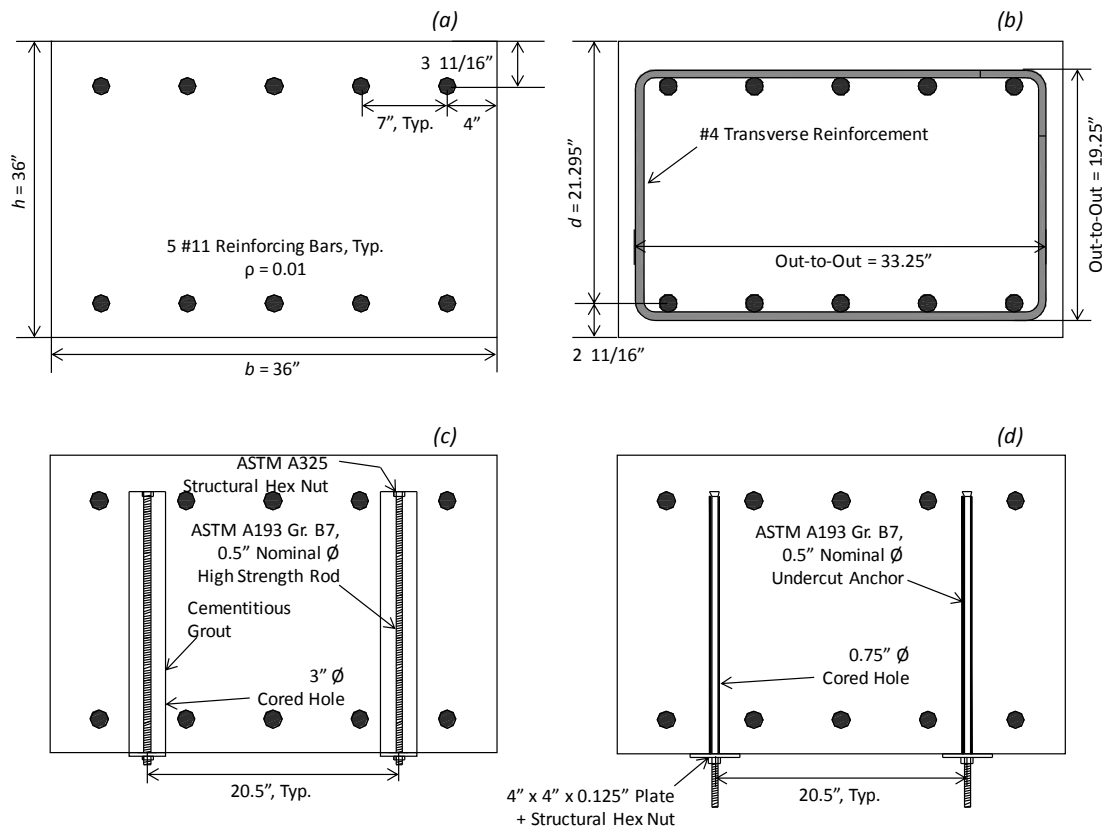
Test span section views. (a) unreinforced control; (b) cast-in-place reinforcement control; (c) grouted anchor retrofit; (d) undercut anchor retrofit
